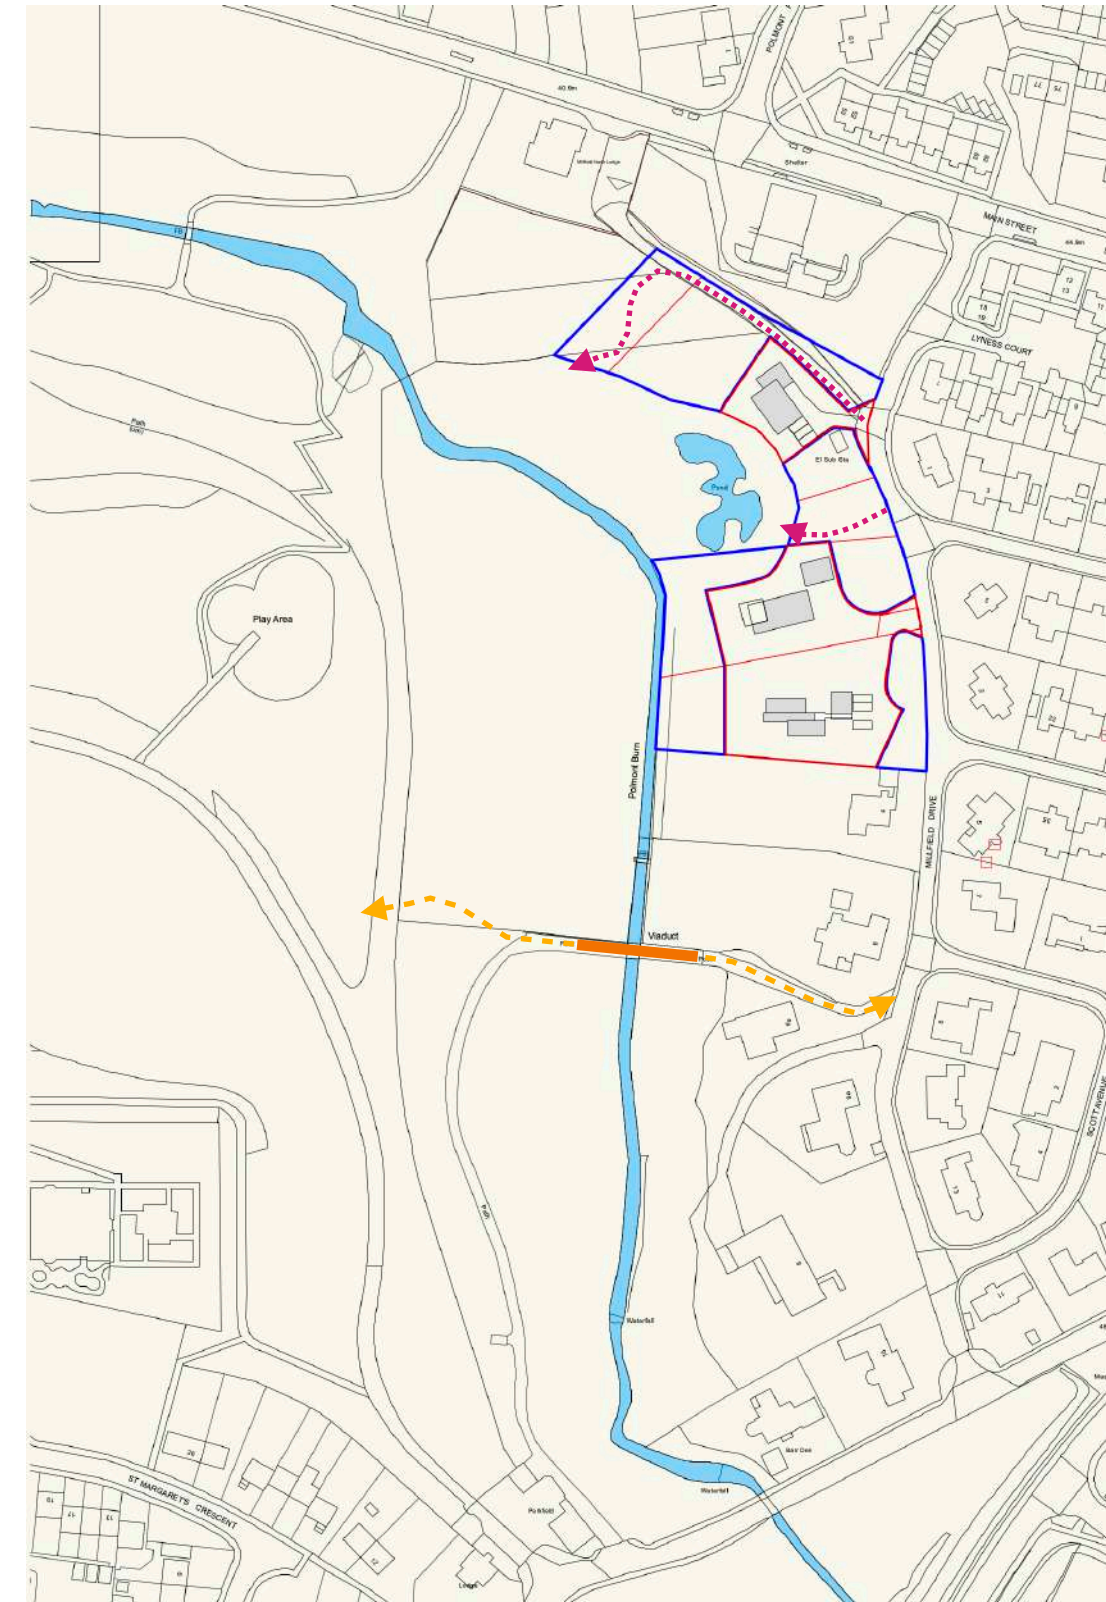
PROPOSED ON AND OFF SITE FOOTPATHS/IMPROVEMENTS
